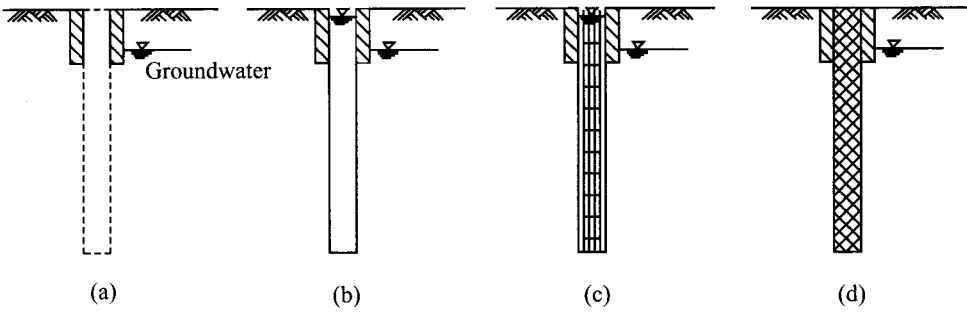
Construction procedure of a diaphragm wall panel: (a) construction of the guided wall, (b) excavation of the trench, (c) placement of reinforcements, and (d) concrete casting.
